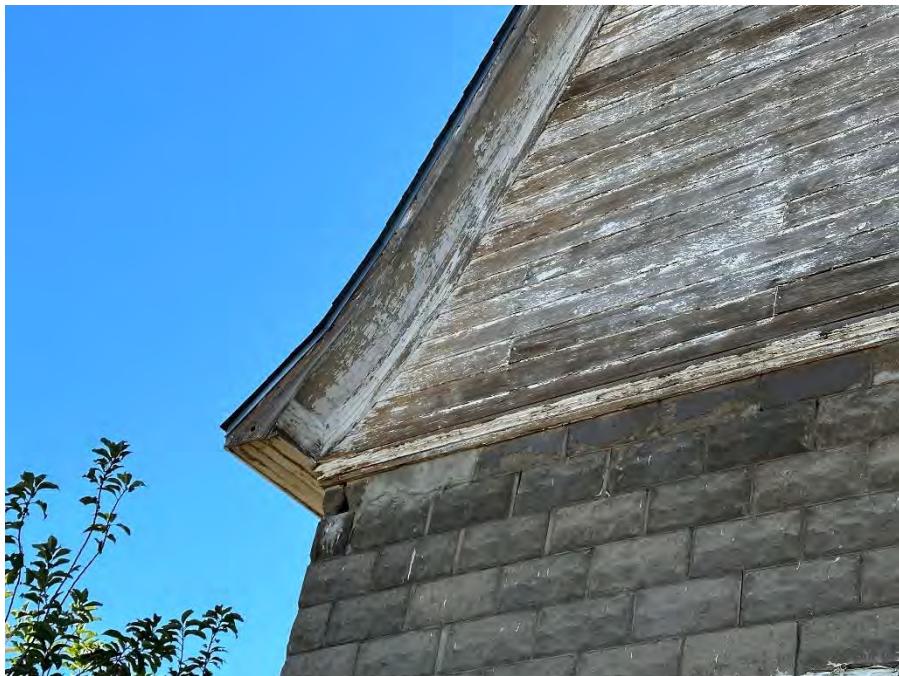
Masonry, trim, and eave conditions at the west gable end.
